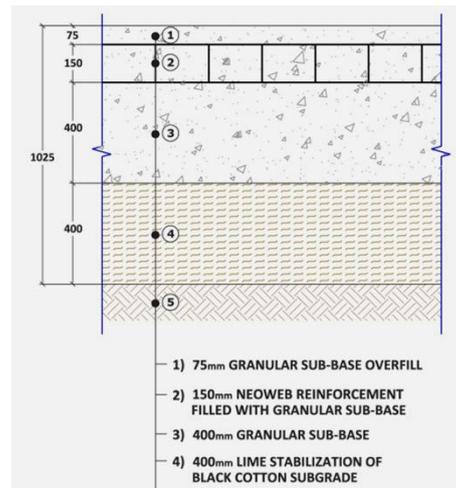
Pavement Structure with Neoweb NPA geocell Reinforcement
